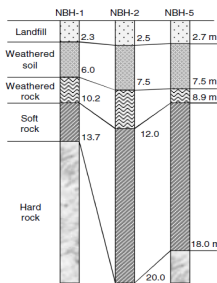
Soil profile at test site Yanghoon Roh et al.(2015)
